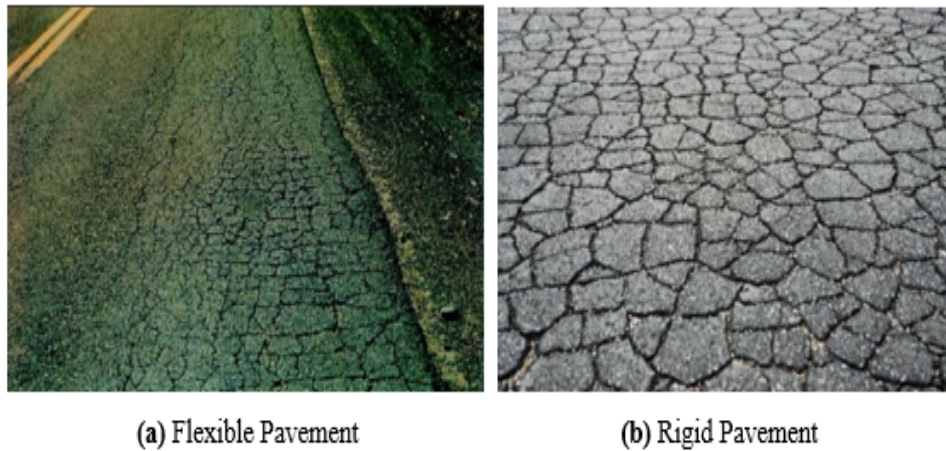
Fatigue Cracking in Pavements [11].
